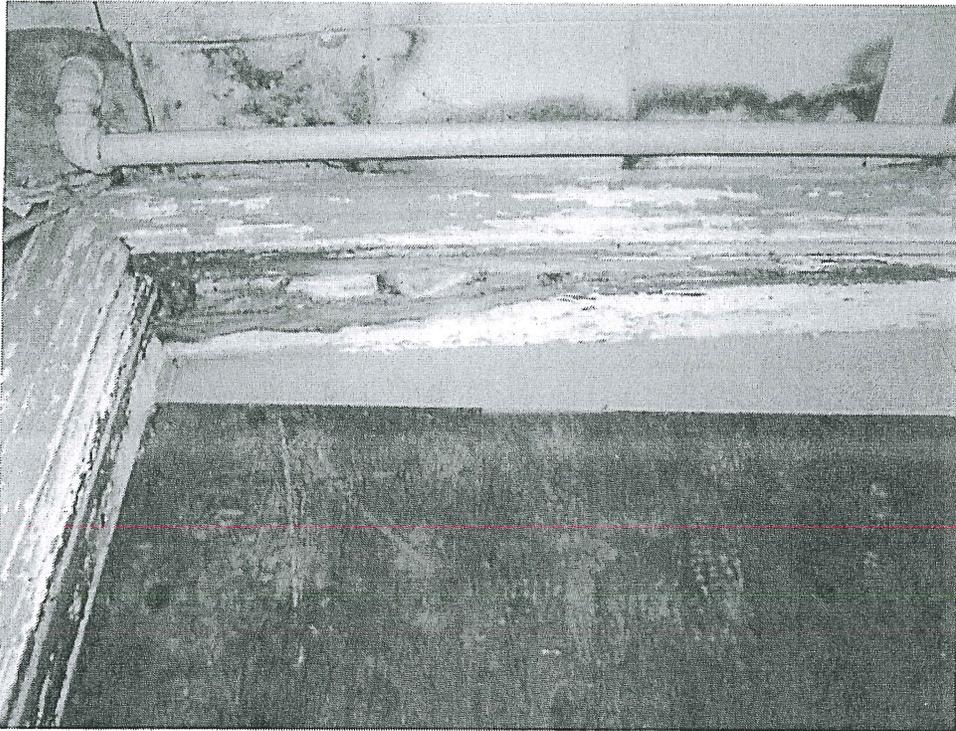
Brick failure over one of the rear windows at the second floor
